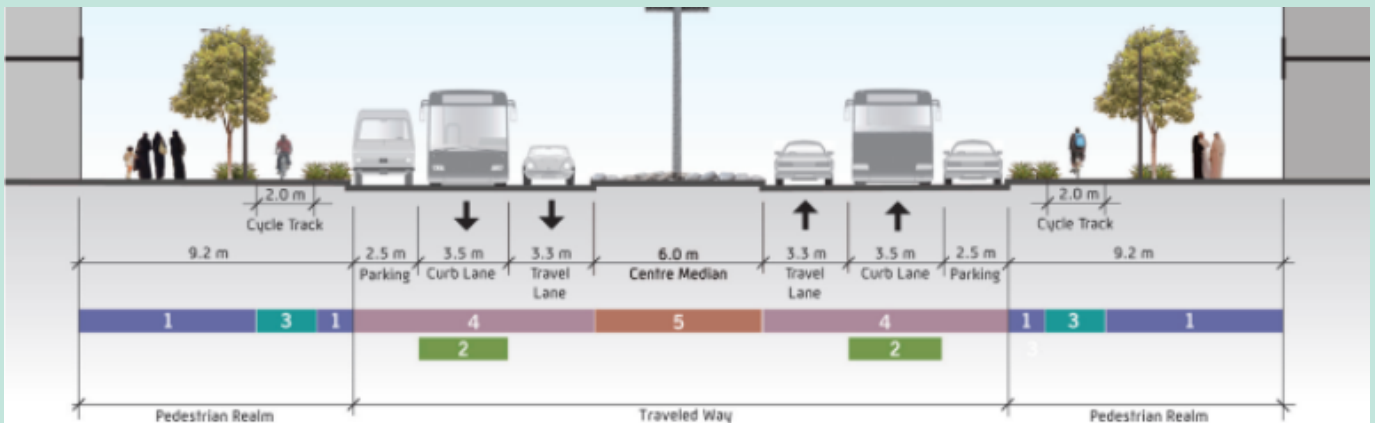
Typical Urban Avenue Section (Haque & Rizwan, 2020)
